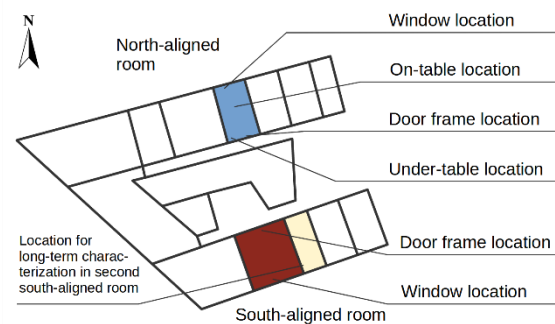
Floor plan of the relevant part of the building showing the orientation of the rooms and indicating the locations of the measurements.
